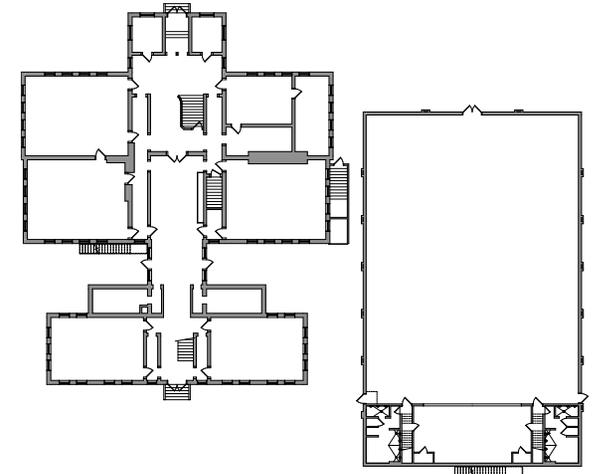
1949 plan showing the 1889 addition and new gymnasium.
